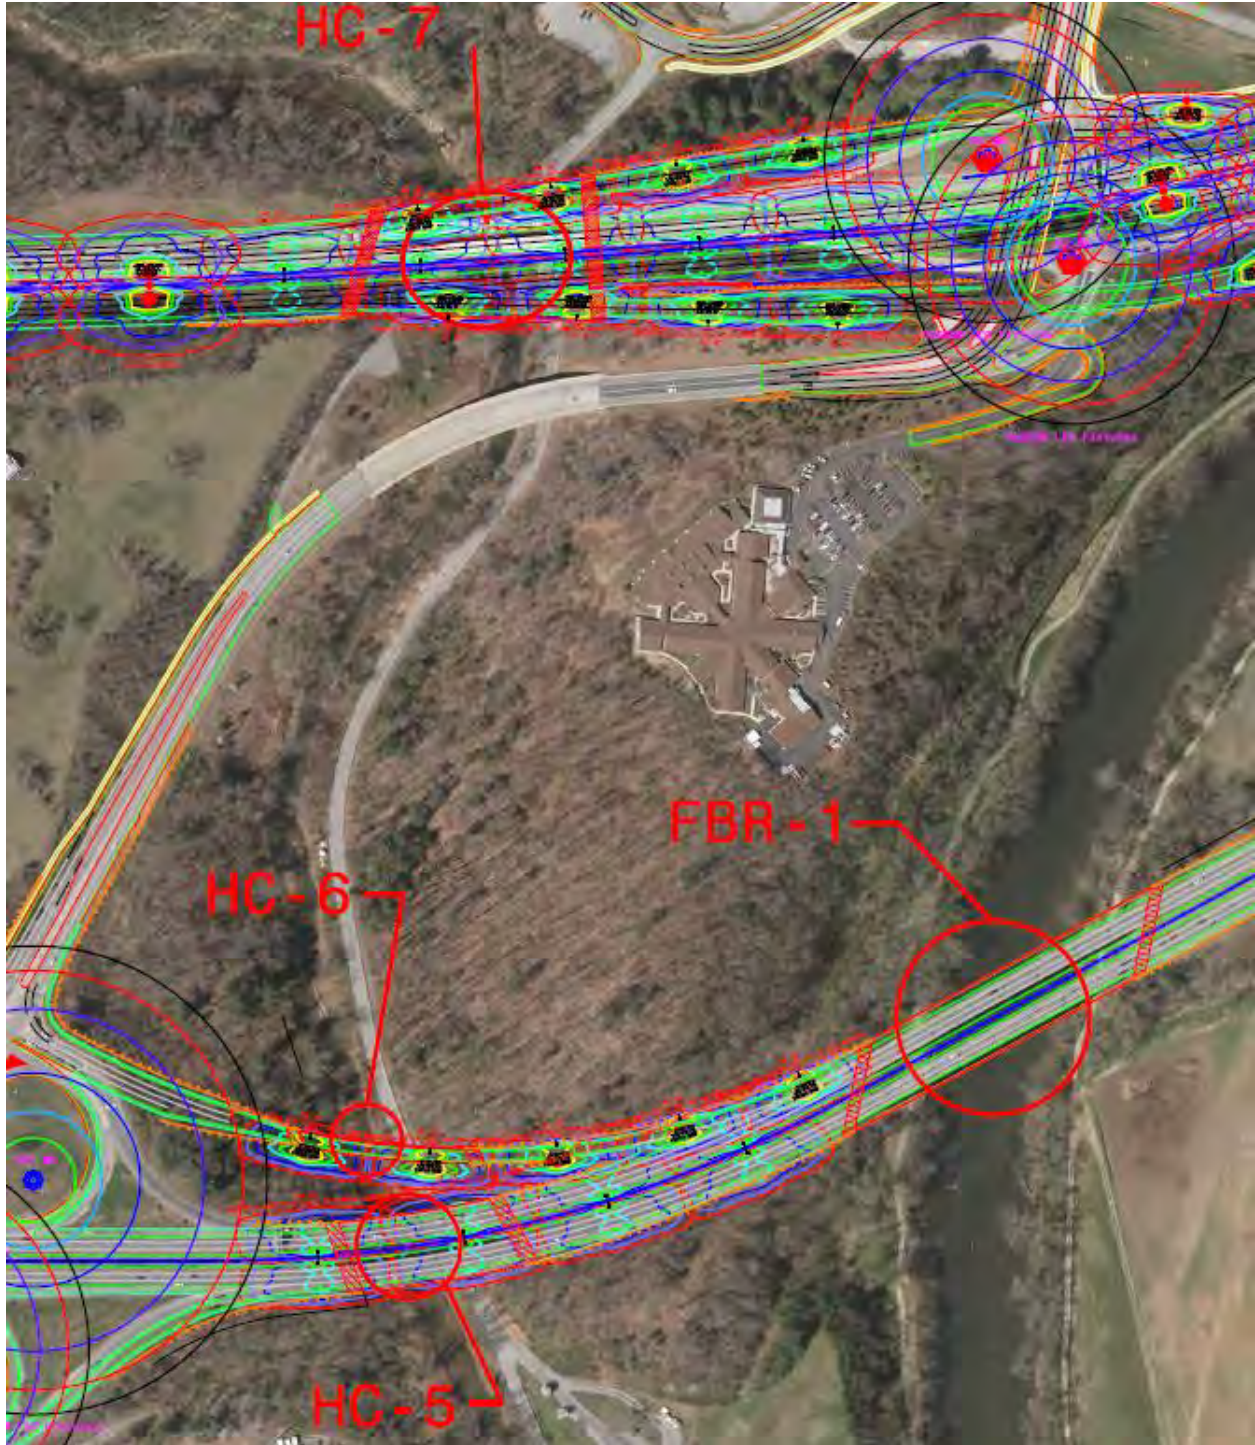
Mitigation lighting layout showing new 1-0-3 BUG fixtures at FBR-1, HC-5, HC-6 & HC-7 crossings.
